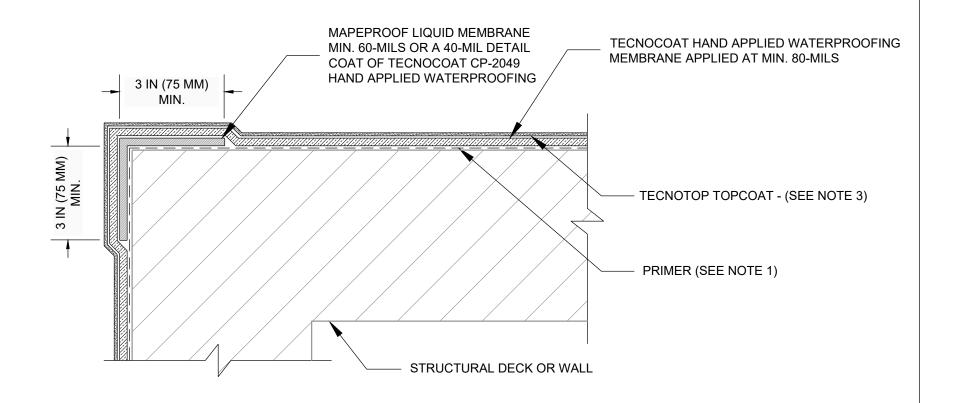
DETAILS ARE INTENDED TO BE A GUIDE FOR WATERPROOFING INSTALLATION ONLY
